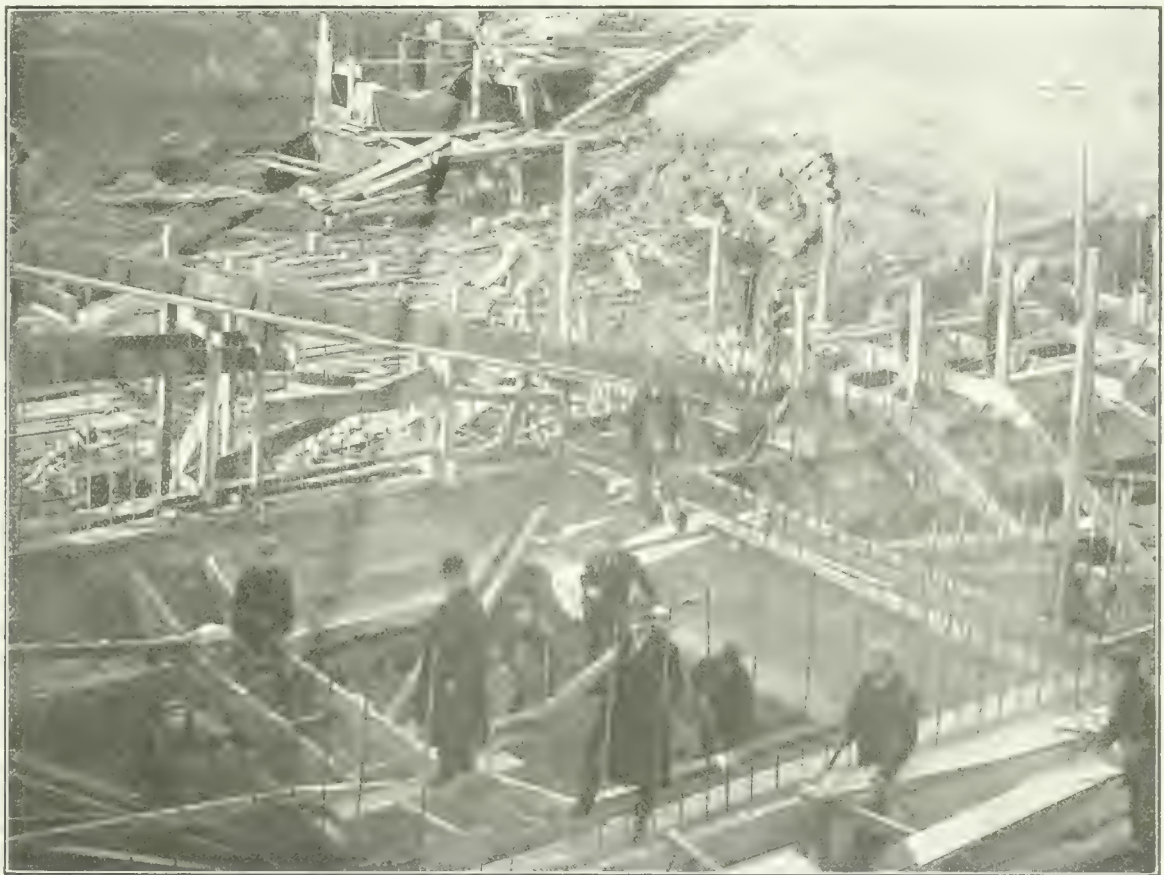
Sedimentation Tank Bottom and Sump Under Construction: Clear Water Drainage Scheme.
